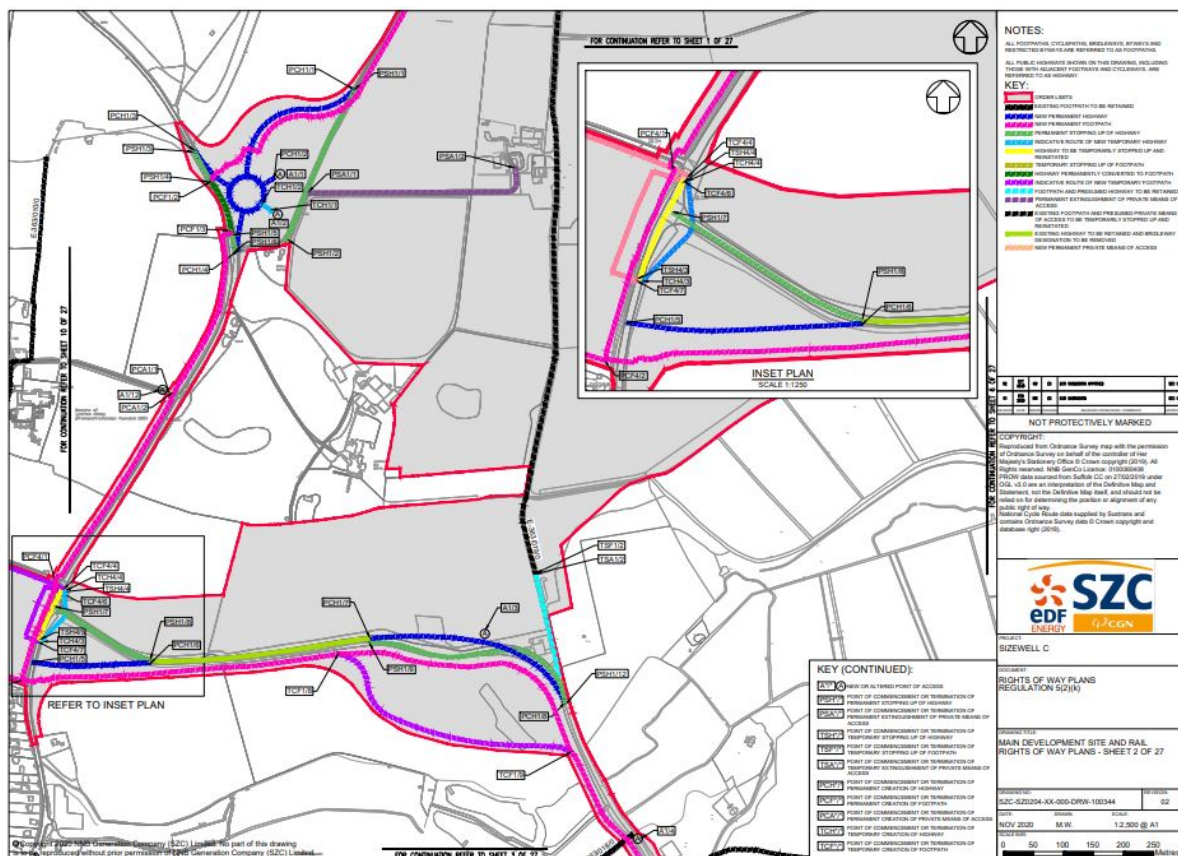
AS 013: Rights Of Way Plans - Sheet 2 of 27
